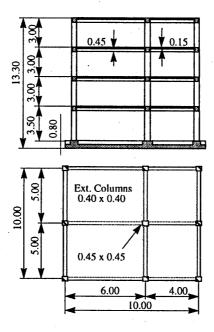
General layout of a full-scale reinforced concrete frame tested in ELSA
